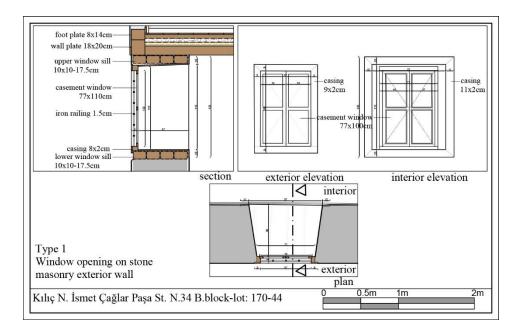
Drawing of window opening located on stone masonry wall, Type 1 (Kılıç N. b. block-lot: 170-44)
